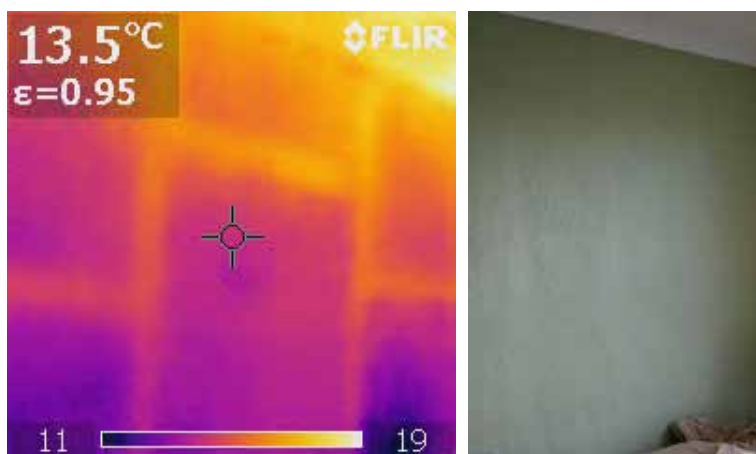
116 Abbeyforegate, Shrewsbury 2011 thermographic survey results – ground floor living room, east wall.
